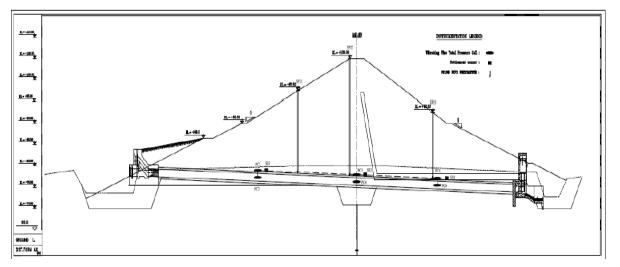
Instrumentation plan of Boostan Dam, section No.4
